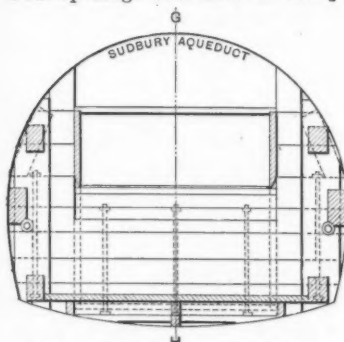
DOWN-STREAM ELEVATION OF WEIR
